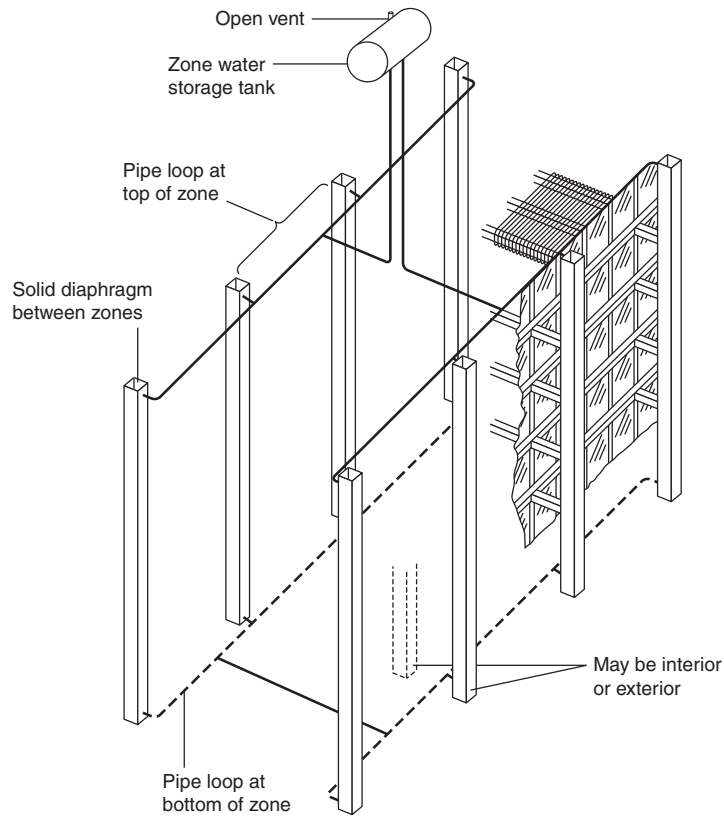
Schematic layout of a typical piping arrangement used in a liquid-filled column fire-protection system.⁴
